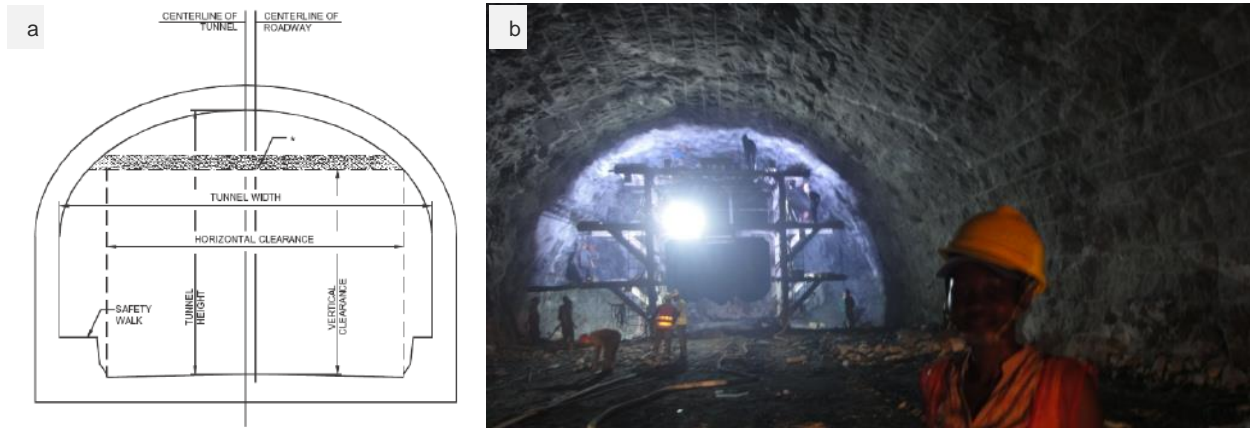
a) Typical horse-shoe section (RTM, 2009) and b) the excavated Karuma tunnel
